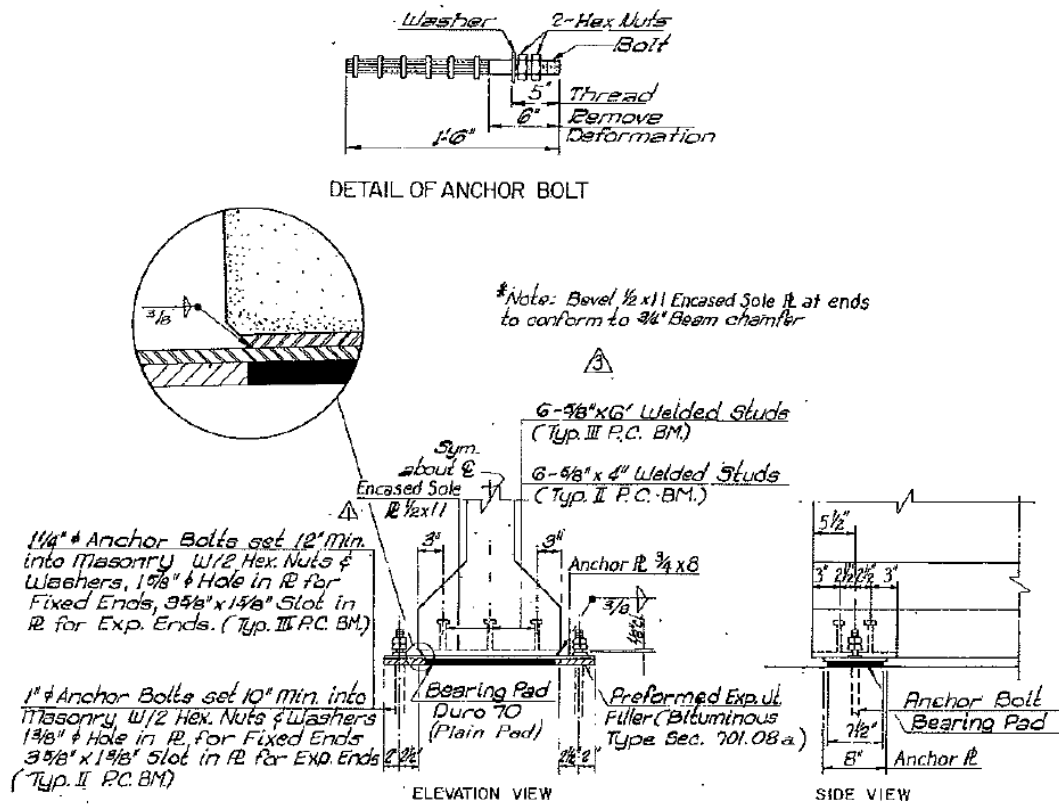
Elastomeric bearing details. Taken from PCB-42.75-3 plans.
